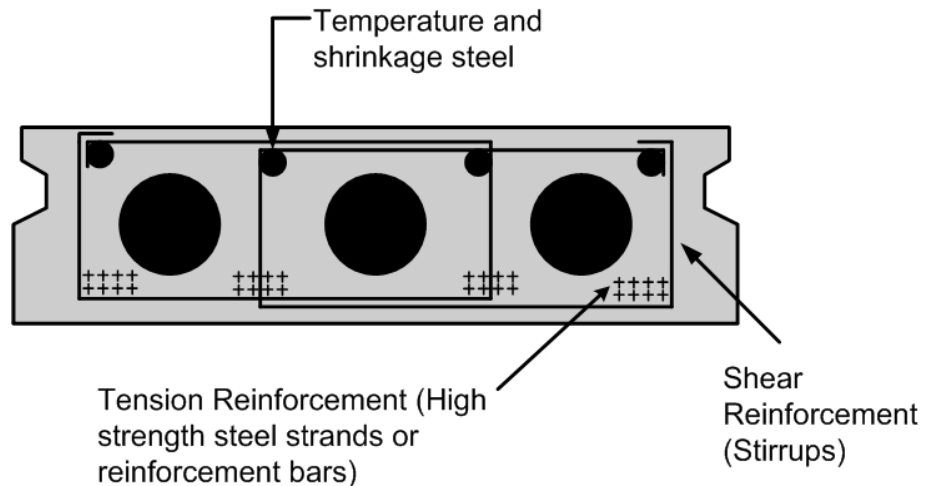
Slab Beam Bridge Tension and Shear Reinforcement
